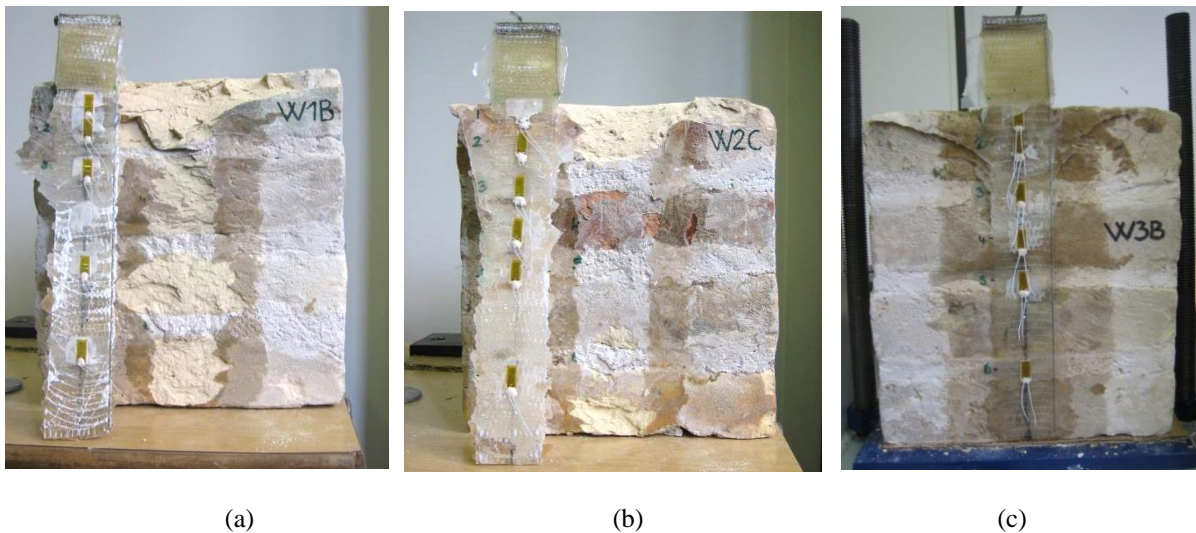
Typical delamination failure of GFRP strip-to-historic-brickwork joint for wallets with different thickness of mortar joints: (a) thickness 4mm; (b) 8mm and (c) 12mm.
